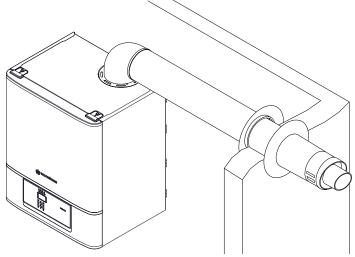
Combi concentric chimney wall outlet for hermetic use.
